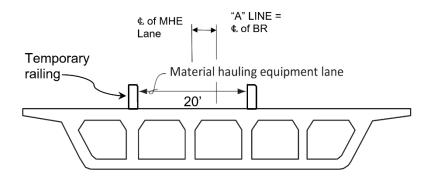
Typical Section Location of Material Hauling Lane
